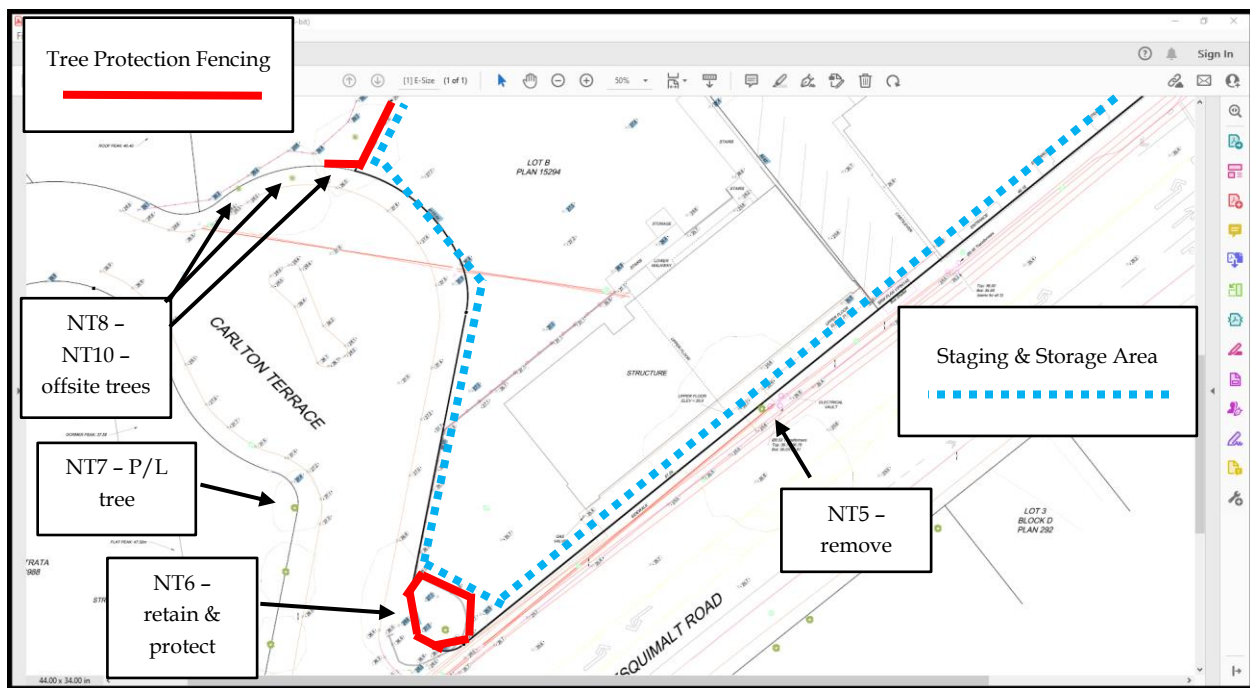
Ground Level – Tree Protection Plan – West Side of Development Area
